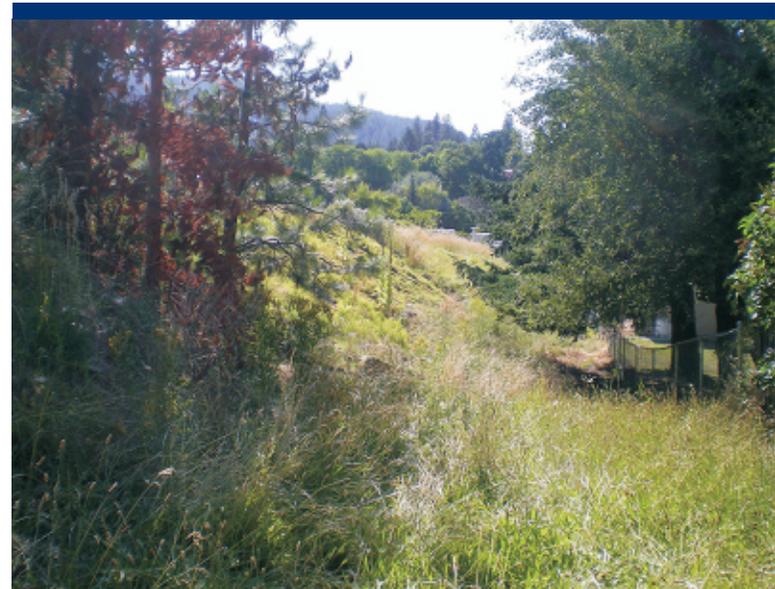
Lower view of the north slope of church parking lot where wall will be constructed.
